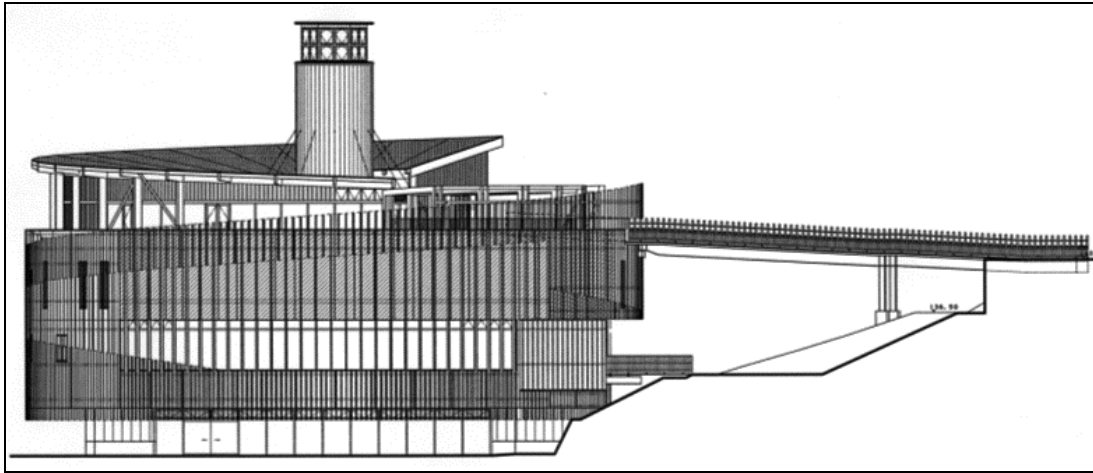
Elevation of Japan Pavilion Seto (south elevation)
